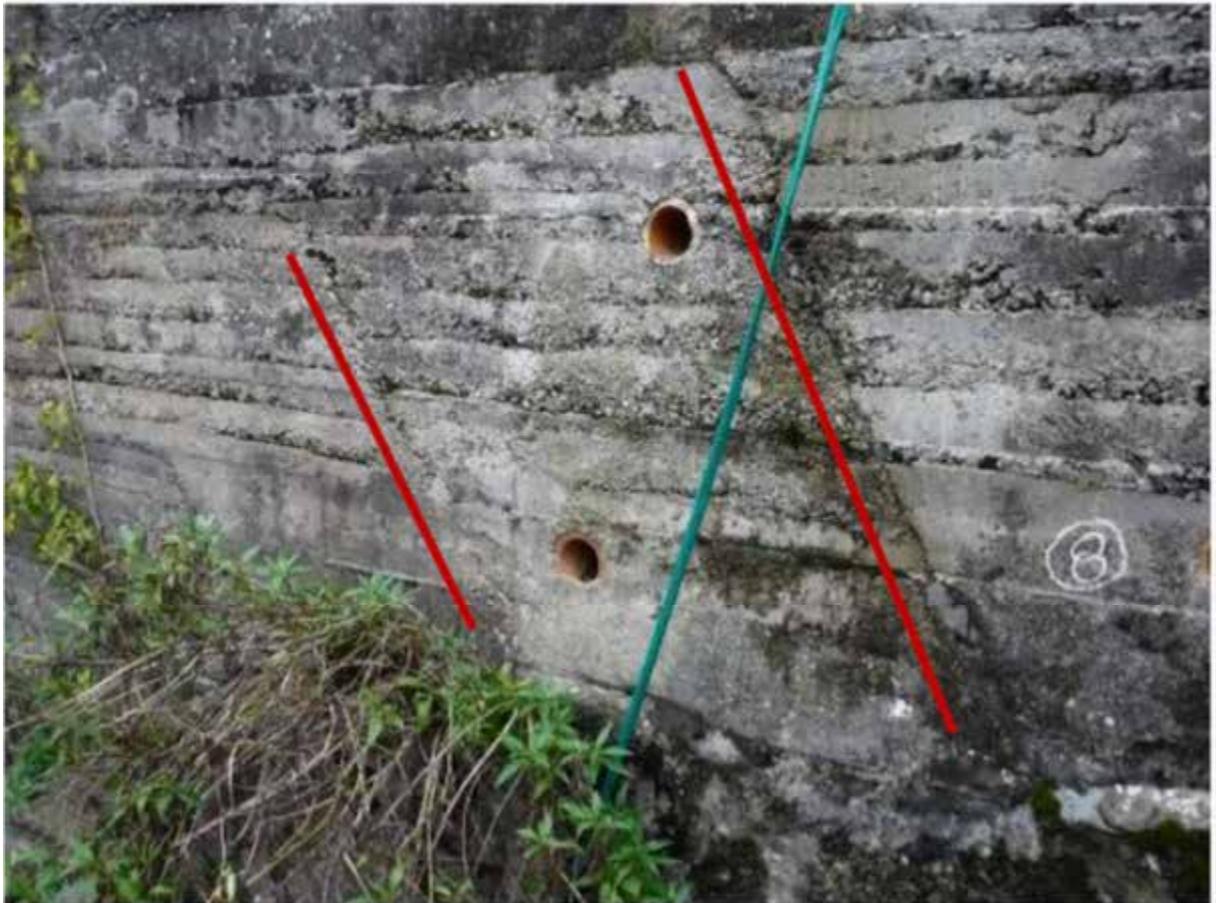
View showing a vertical crack in the upper section of the retaining wall at CH 7.5m.
